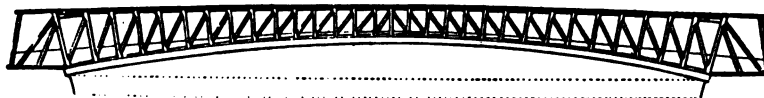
FAIRMOUNT BRIDGE OVER SCHUYLKILL.
